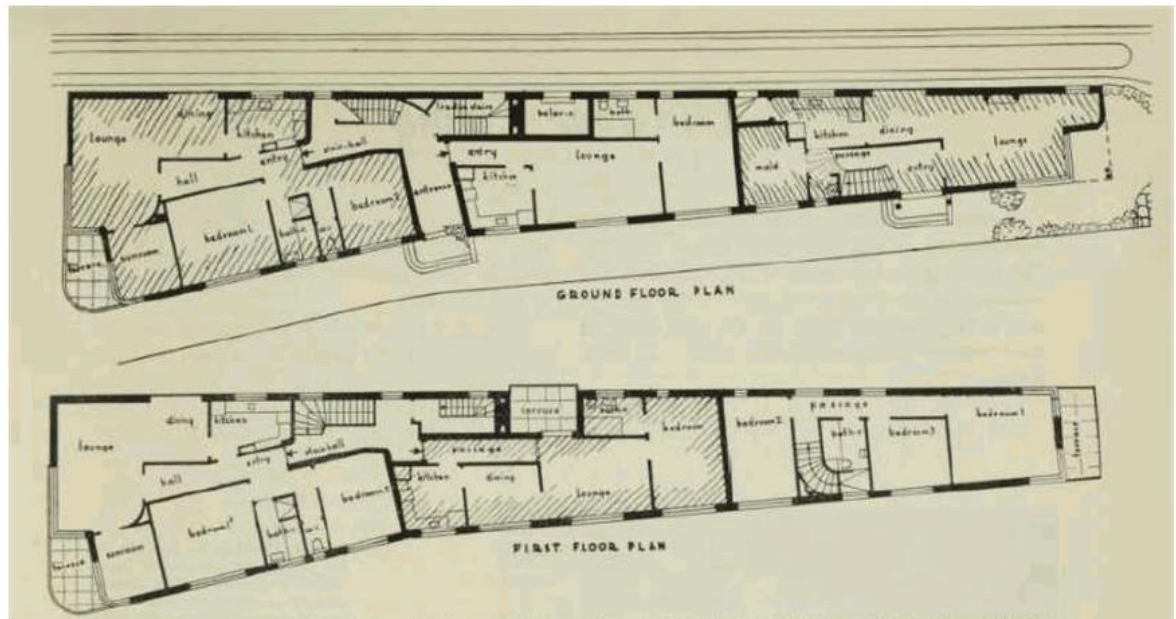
The building's floor plan shortly after completion as published in *Decoration and Glass*, Vol.15 No.2 (July-August 1949), p.25
